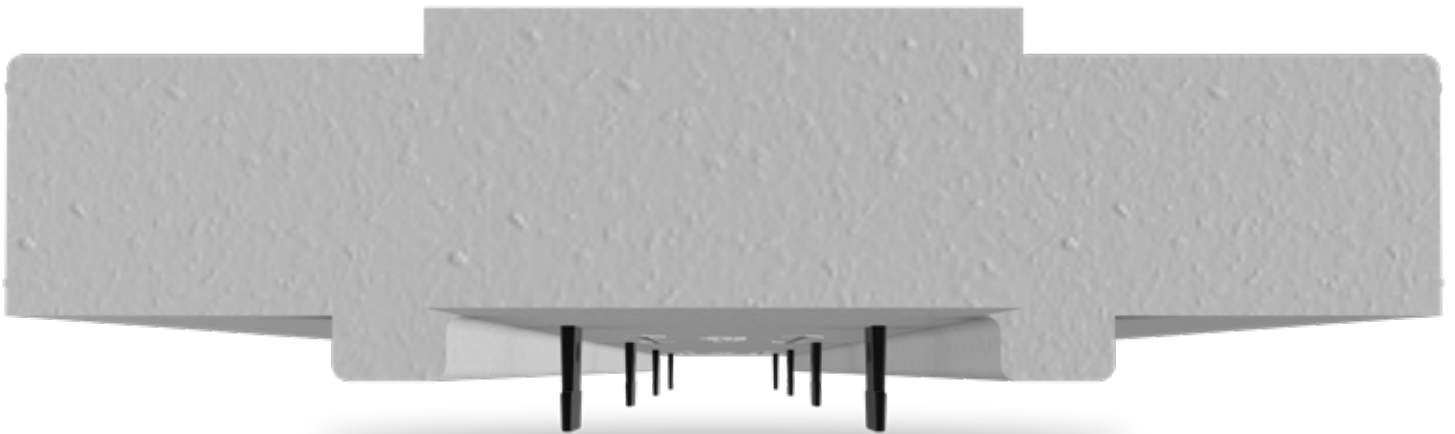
BuildBuck Buck showing end connection and "T" concrete anchors.
